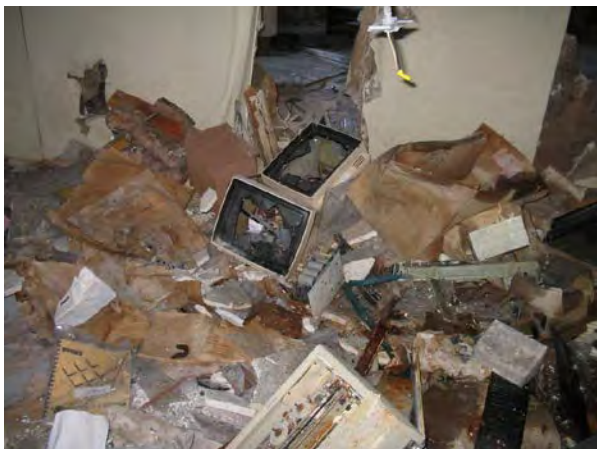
Vandalism and weather damage in 415 Orchard St. building, 2006.
